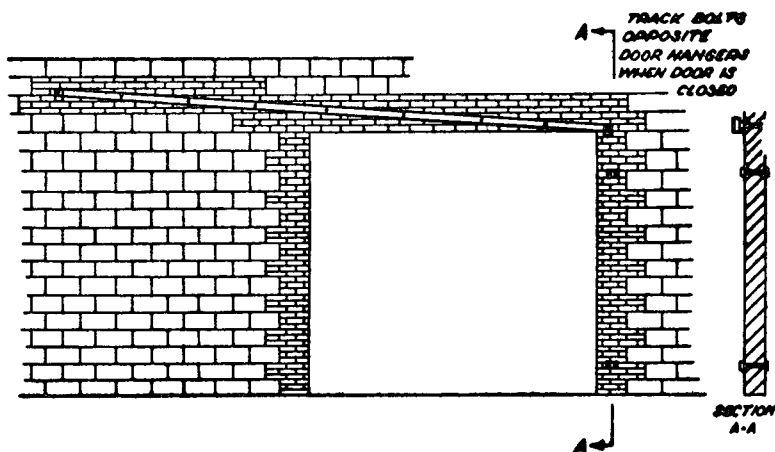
Hollow concrete masonry wall prepared for a single tinclad or sheet metal sliding door, standard method.
